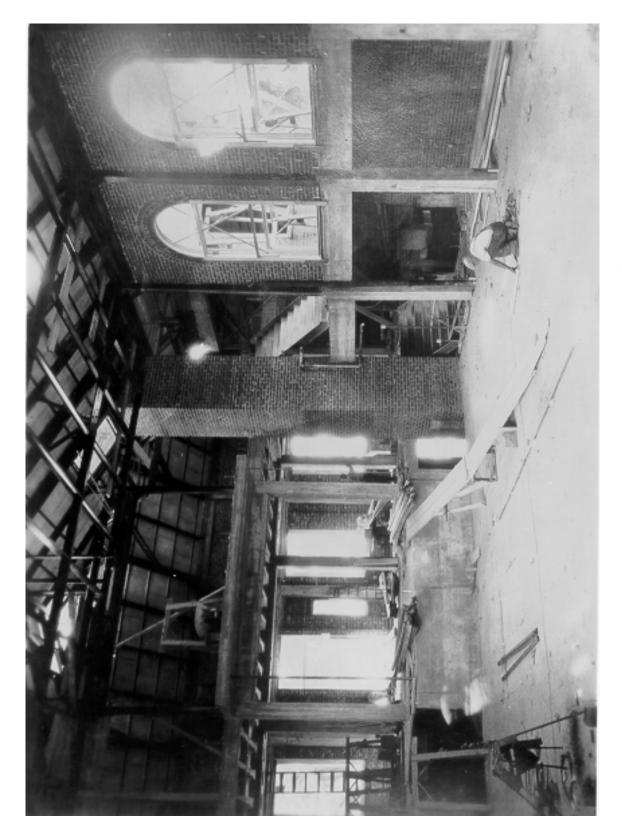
Morristown Museum Building: auditorium during construction, view south/southwest toward foyer (June 1936).
